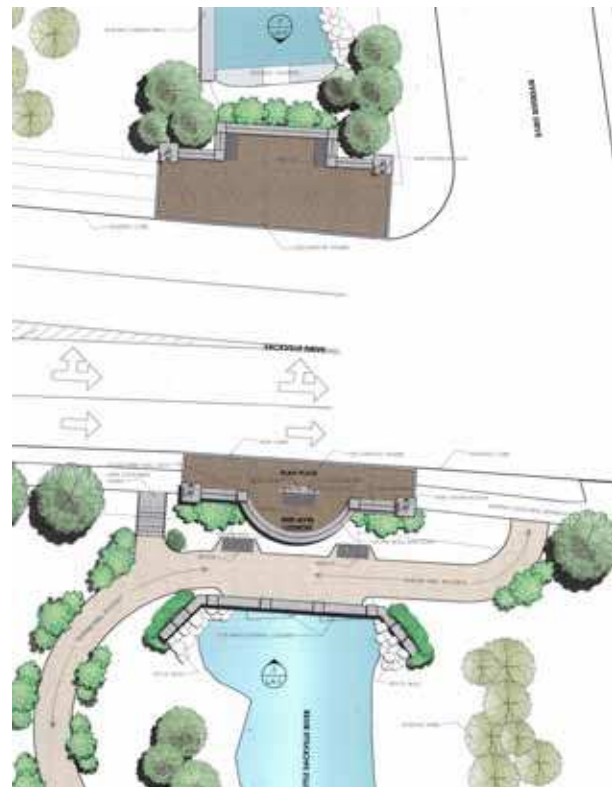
Plans to upgrade the culverts under Sackville Drive include a path way, seating area, and landscape features. This project is scheduled for completion in 2012. (Image Source: HRM)
